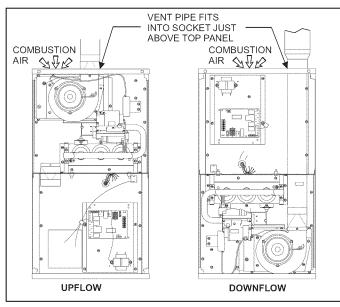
Combustion Airflow Path Through The Furnace Casing to the Burner Box
